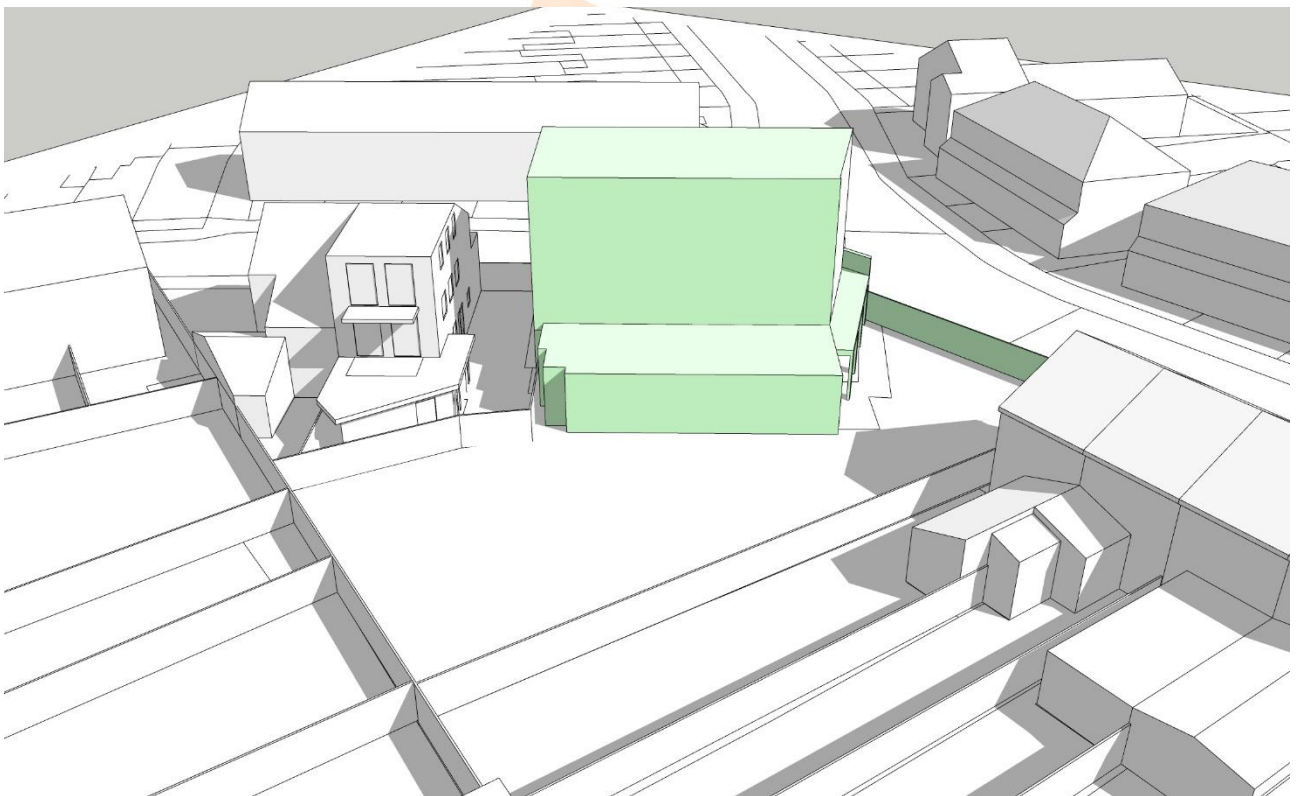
As existing 3D model viewed from South West. Shadows set to 12pm, 21st March.
